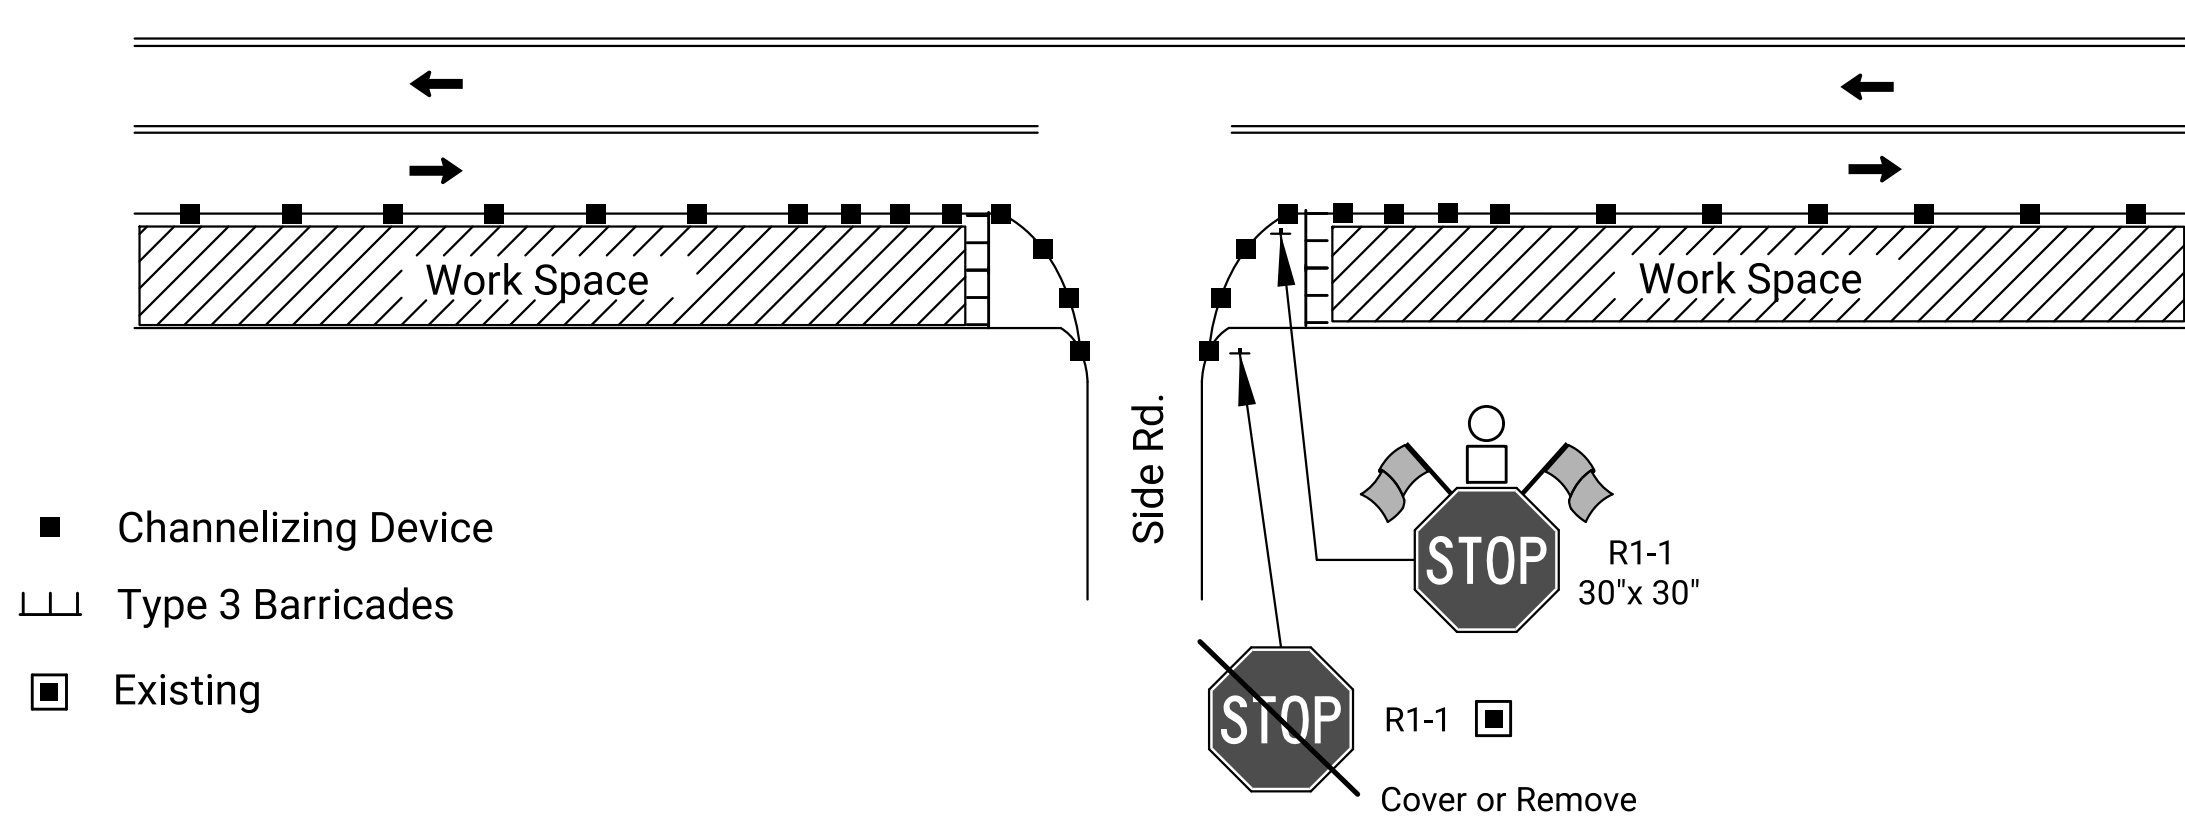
SIDE ROAD OR ENTRANCE OPEN THROUGH WORK AREA
